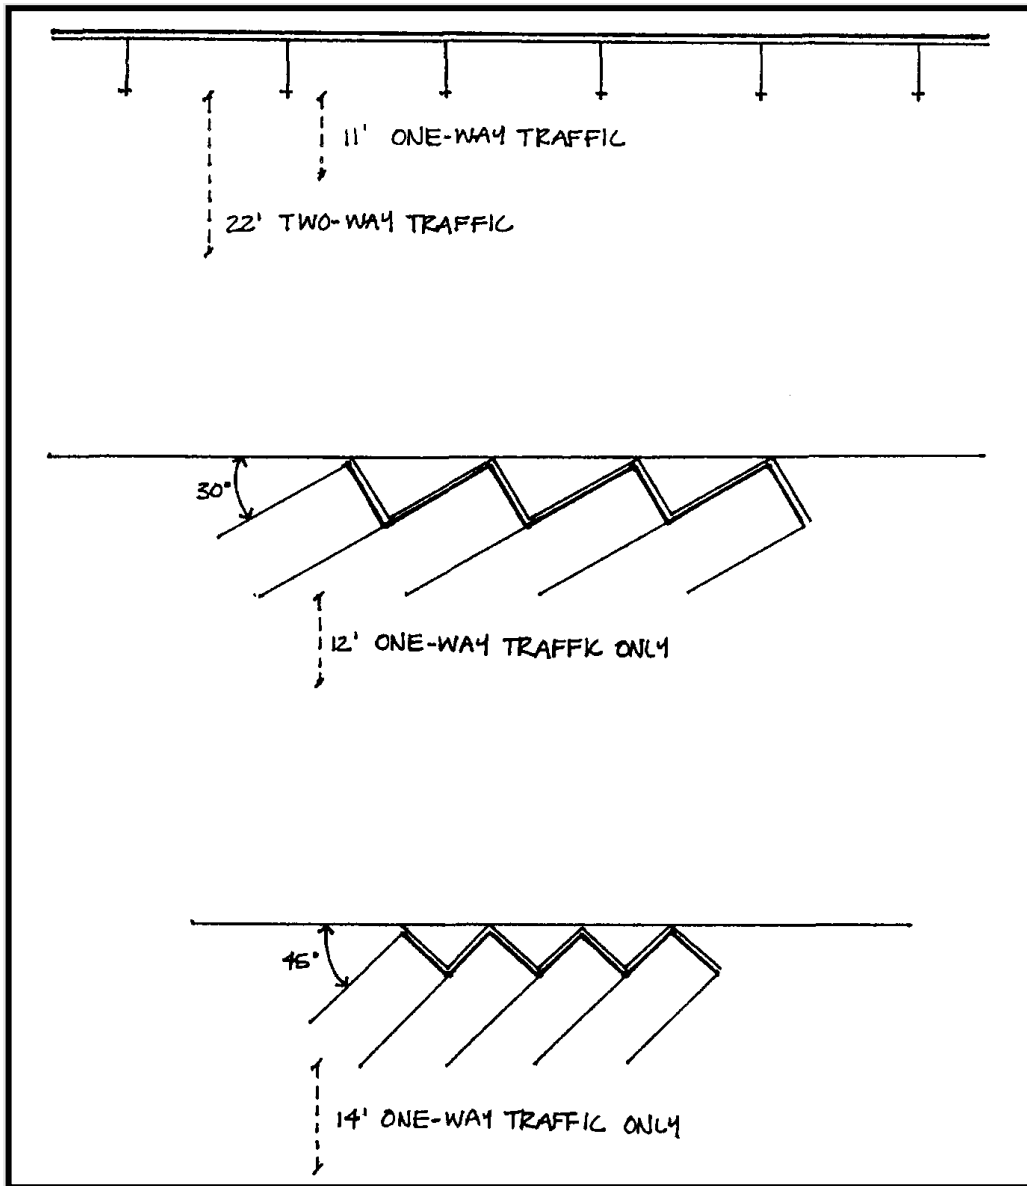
Parking Aisle Dimensions for parallel and angled parking spaces of 30 and 45 degrees.
